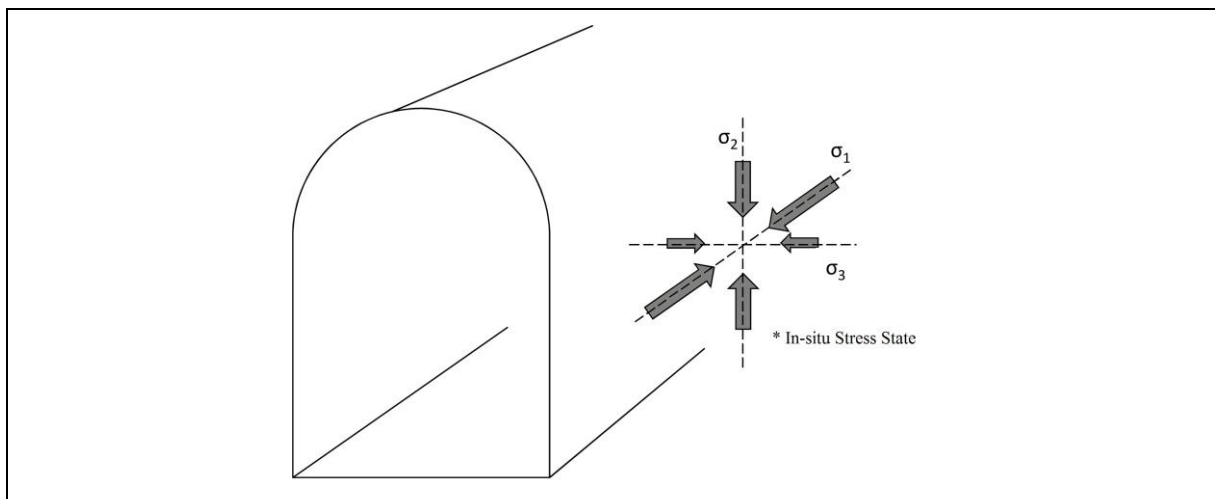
High Gallery Cavern Needs Greater Wall Stability
